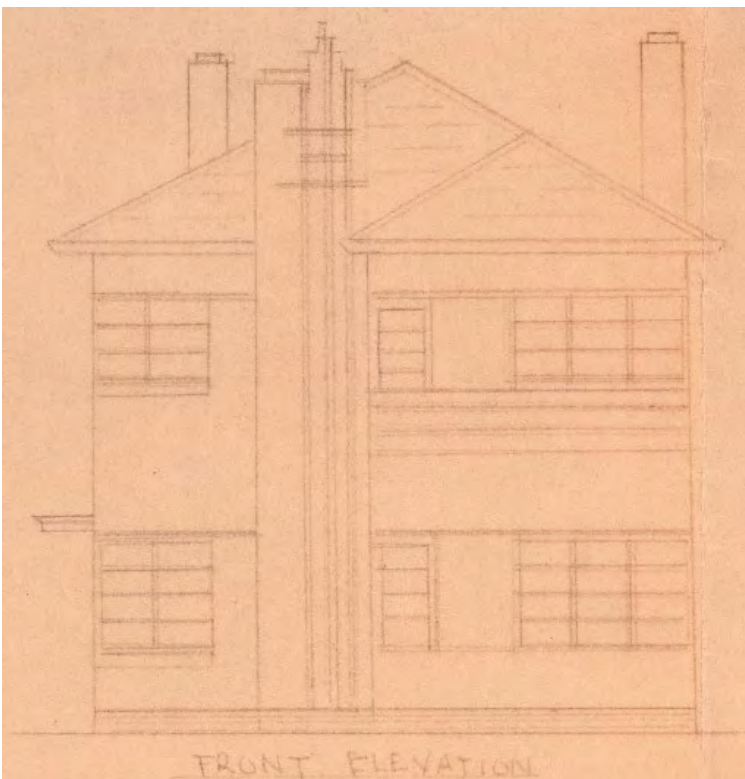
Original drawing, front elevation of 58A Westbury Street. (Source: Council building file)
